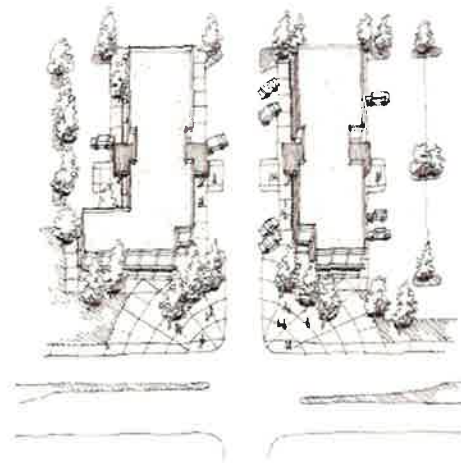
Retail buildings create a facing commercial frontage and provide visual access from the adjacent neighborhood.
